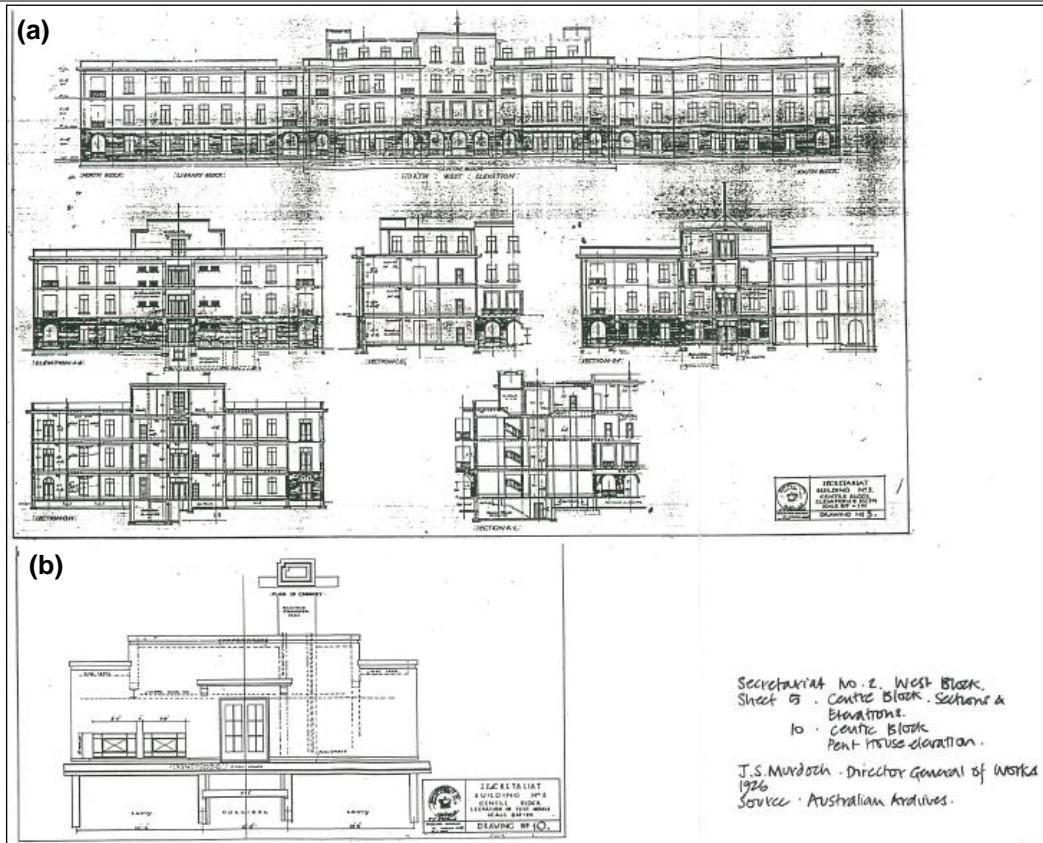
1926 Elevations: (a) Central Block Section A Elevations; (b) Centre Block Pent House Elevation
